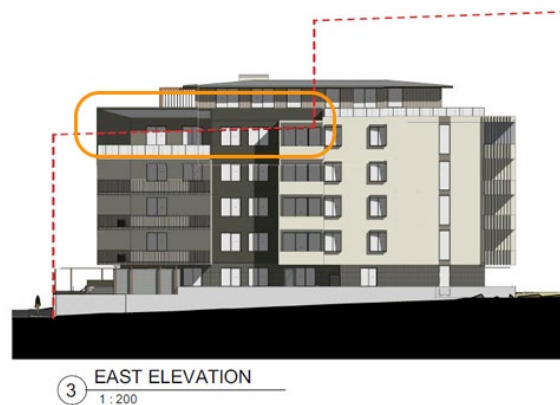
Building envelopes highlighting the encroachment on level 4 East Elevation
